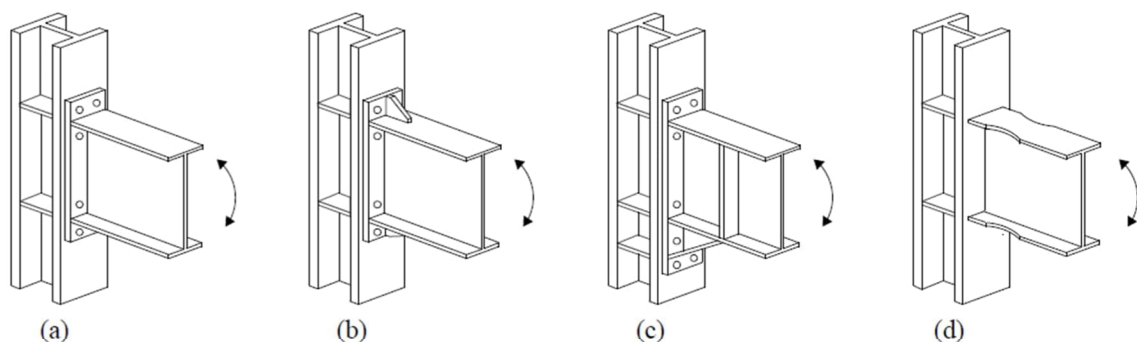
Beam-to-column joints prequalified in the framework of EQUALJOINTS project: a) Bolted haunched joint b) Bolted extended stiffened end-plate joint c) Bolted extended unstiffened end-plate joint d) Welded dog-bone joint
